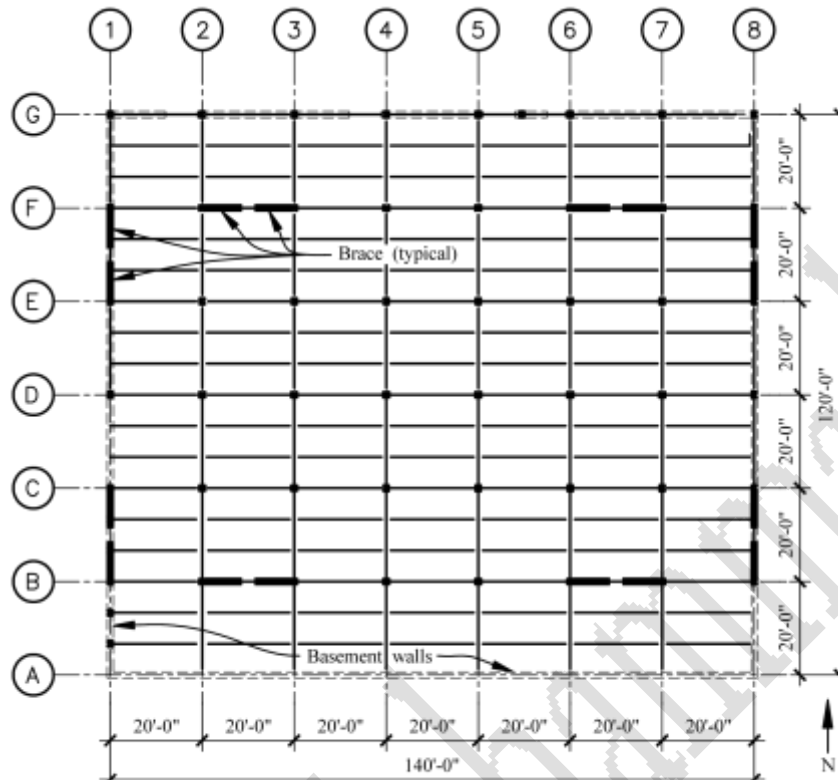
Main floor framing plan (1.0 in. = 25.4 mm, 1.0 ft = 0.3048 m).
